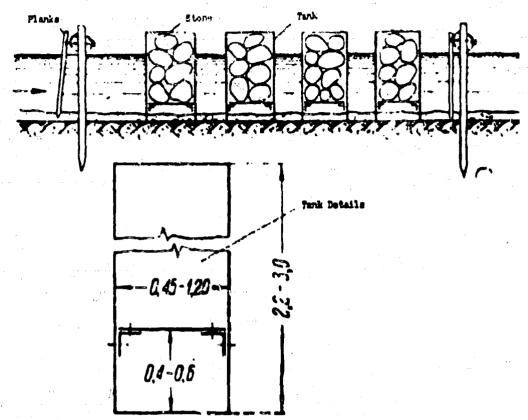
Excavation in a Streem by Freezing Method Utilizing Iron Tanks
